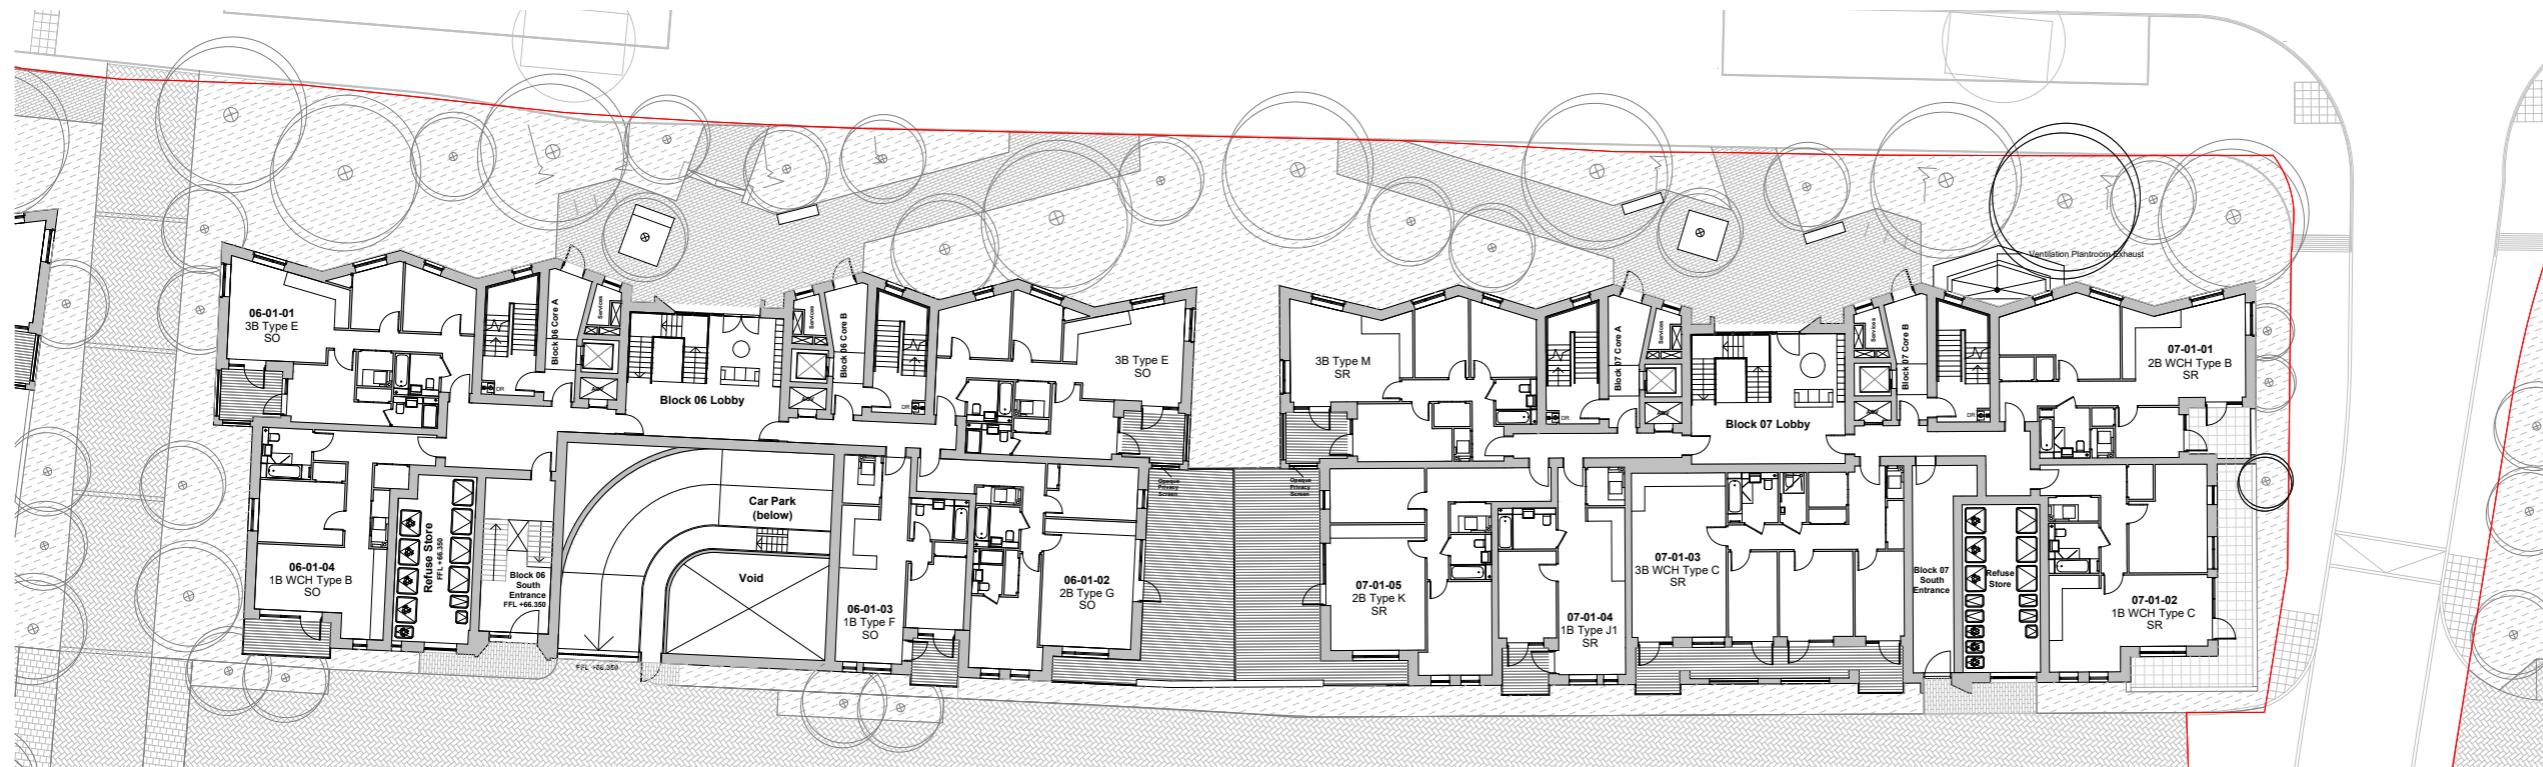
Block 6 & 7 Ground Floor Plan as proposed
